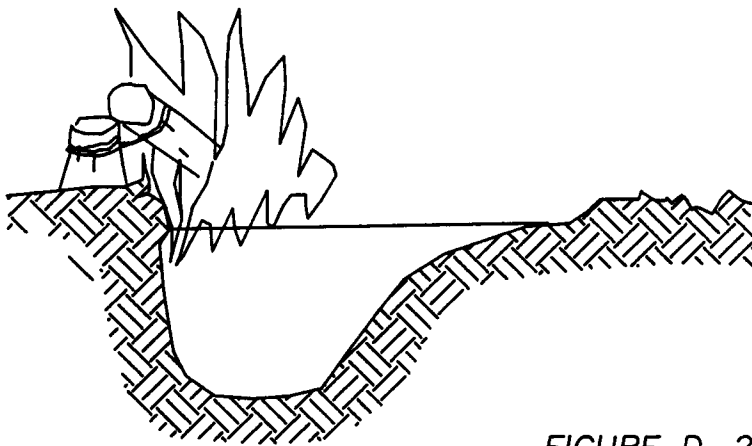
PLACEMENT OF TREE SHELTERS IN A STREAM.
